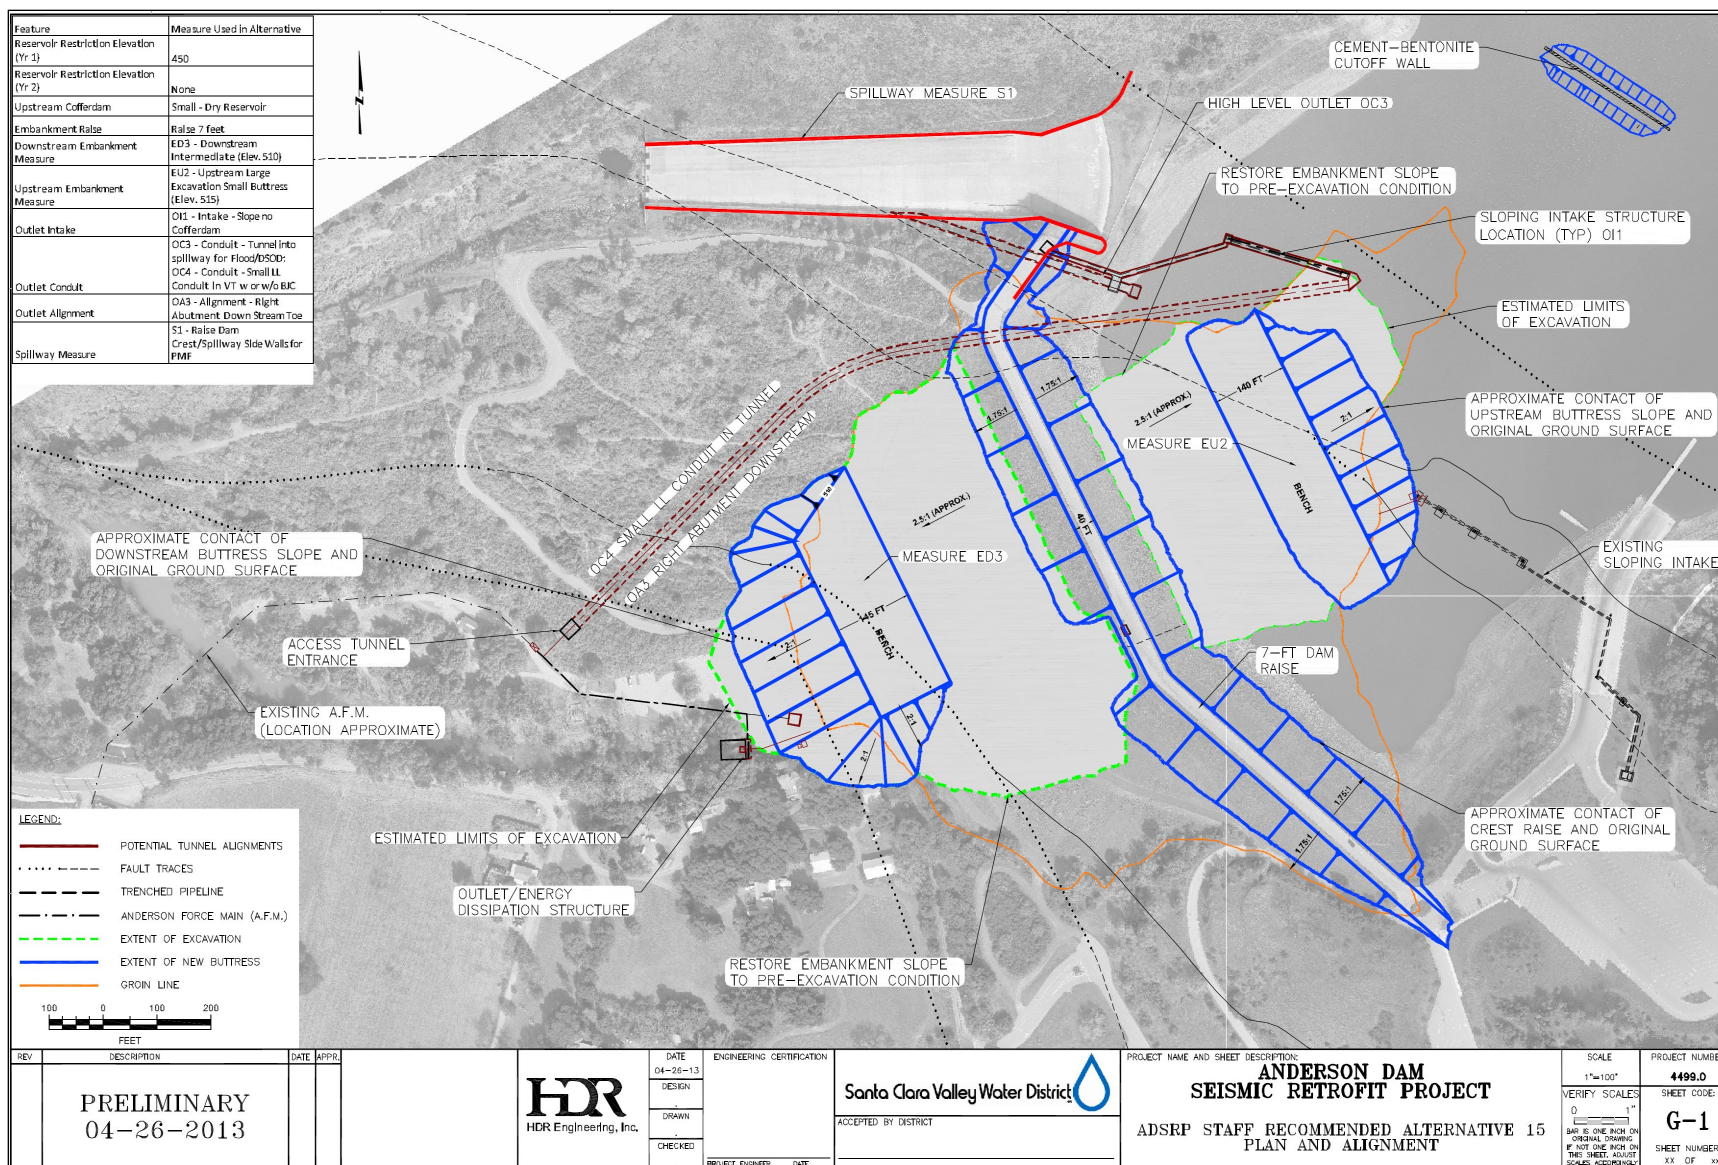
Conceptual Plan of the Staff Recommended Alternative as Outlined in the Planning Study Report
